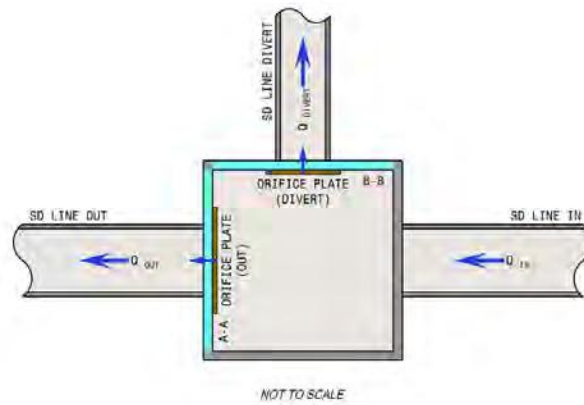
Stormdrain Diversion Structure Concept: Plan View for WDS # 1
